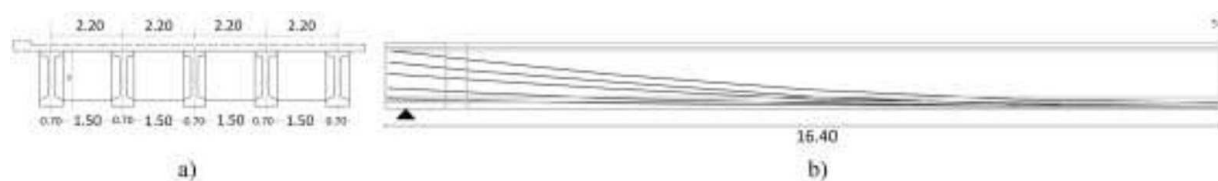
a) Bridge deck's cross-section; b) longitudinal profile of the beam and layout of the post-tensioning cables for half length.
